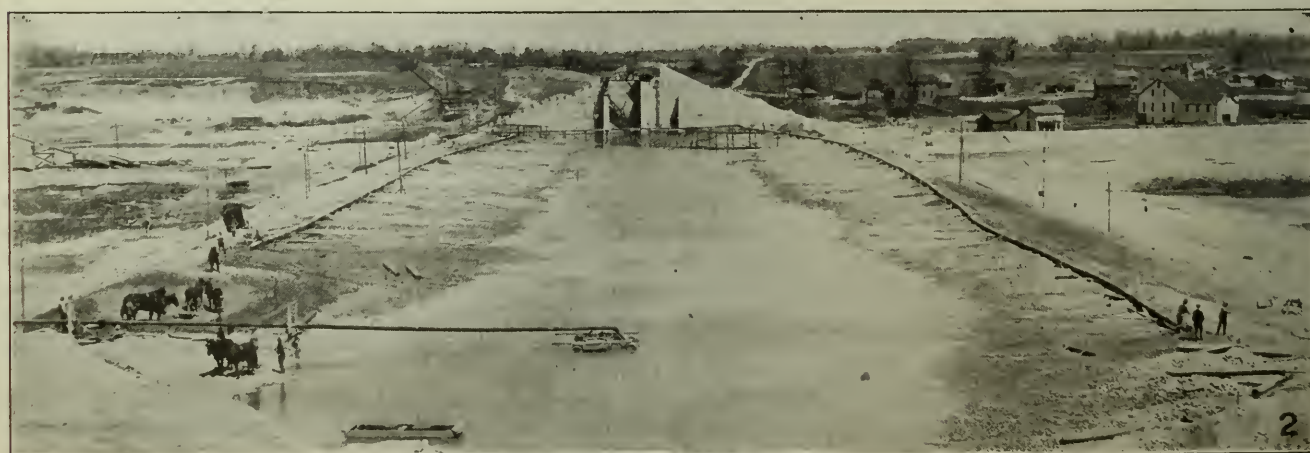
TYPICAL CORE POOL AND PIPE LINE ARRANGEMENTS
